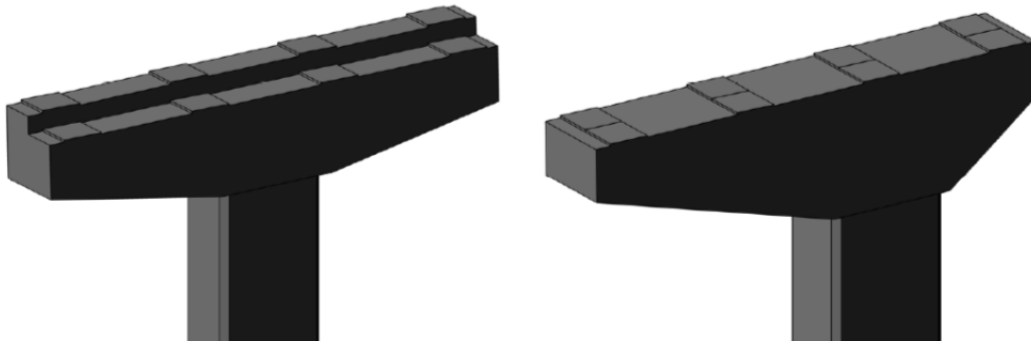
a) Balanced Hammerhead Pier b) Unbalanced Hammerhead Pier
